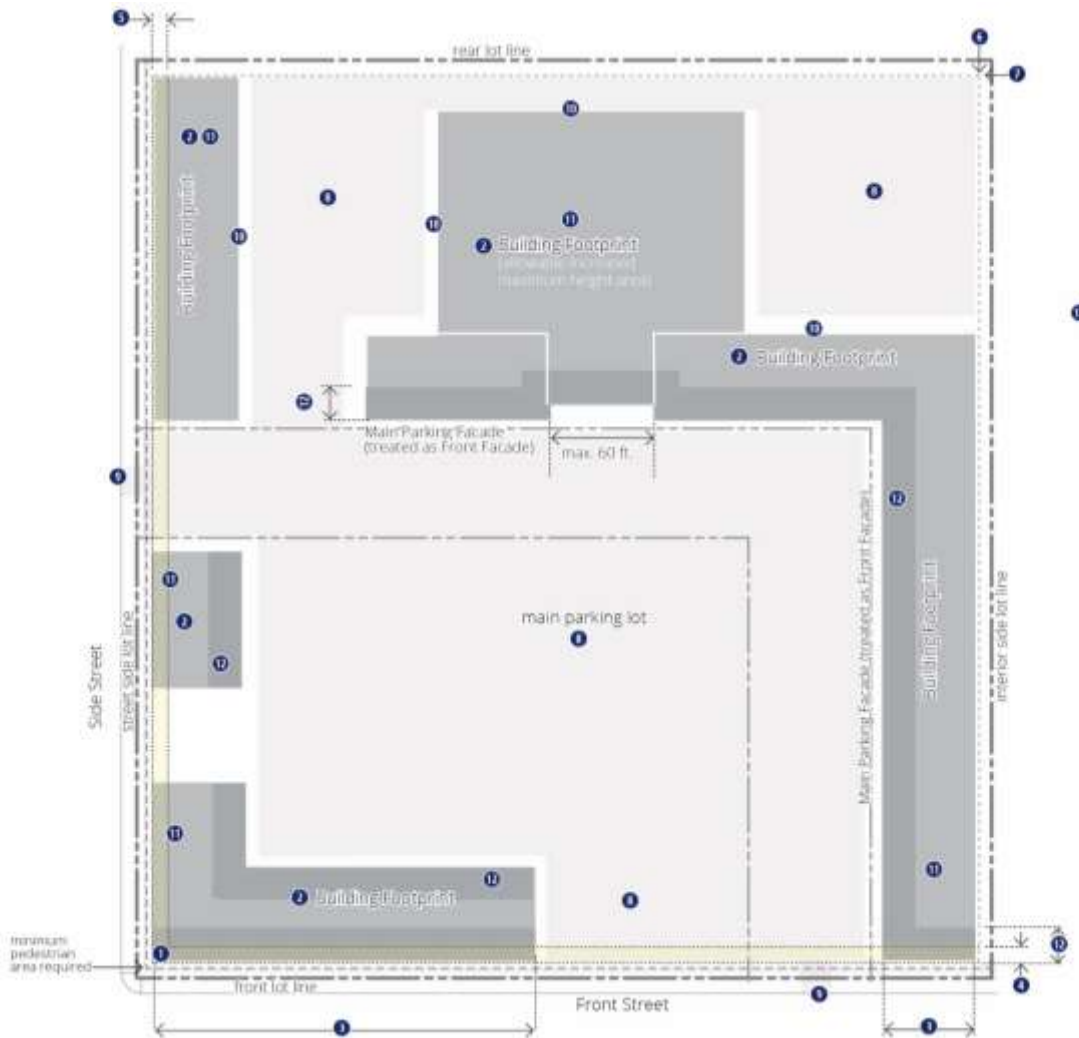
(2). CMU district diagrammatic plans and elevations.
